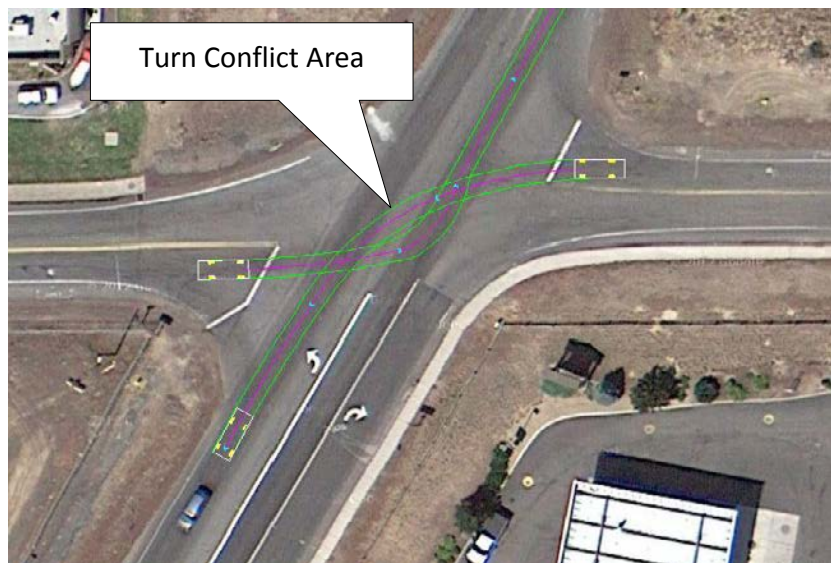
1st Street – Reed Road example of conflicts that occur due to intersection offset.
